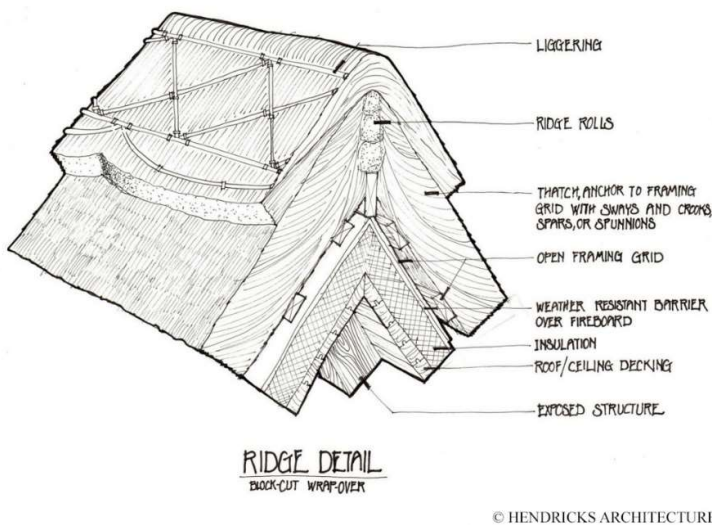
2nd Roof Solution Ridge Detail (20)
